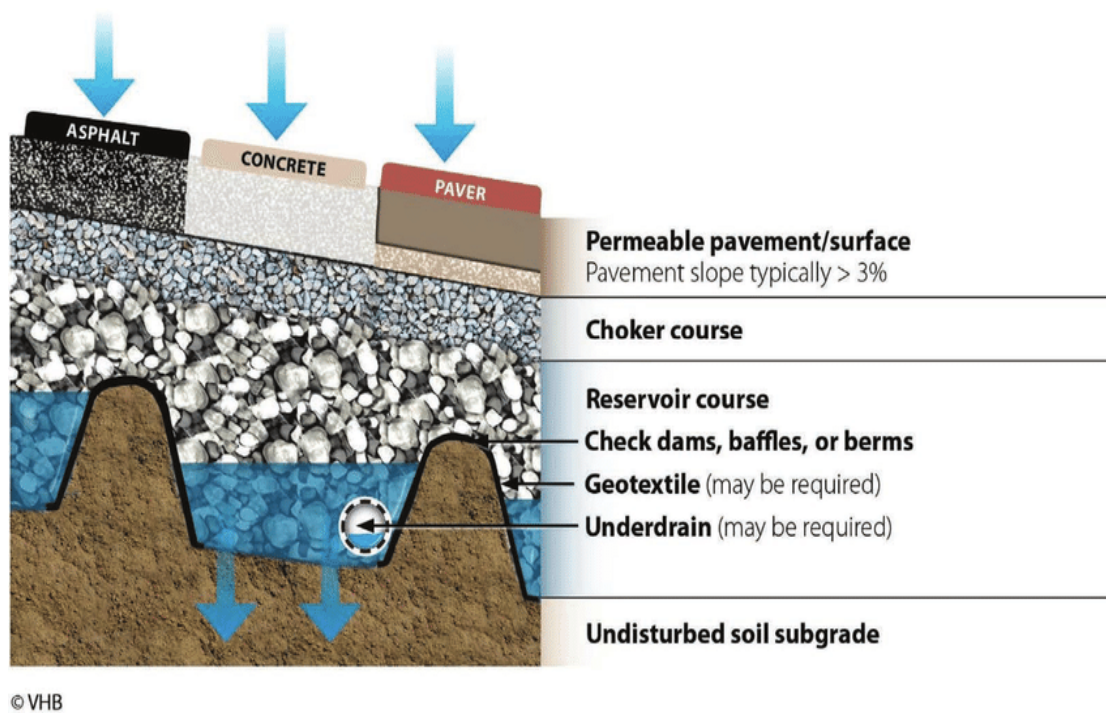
Permeable Pavement. (Geddes & Grosset, 2005)
